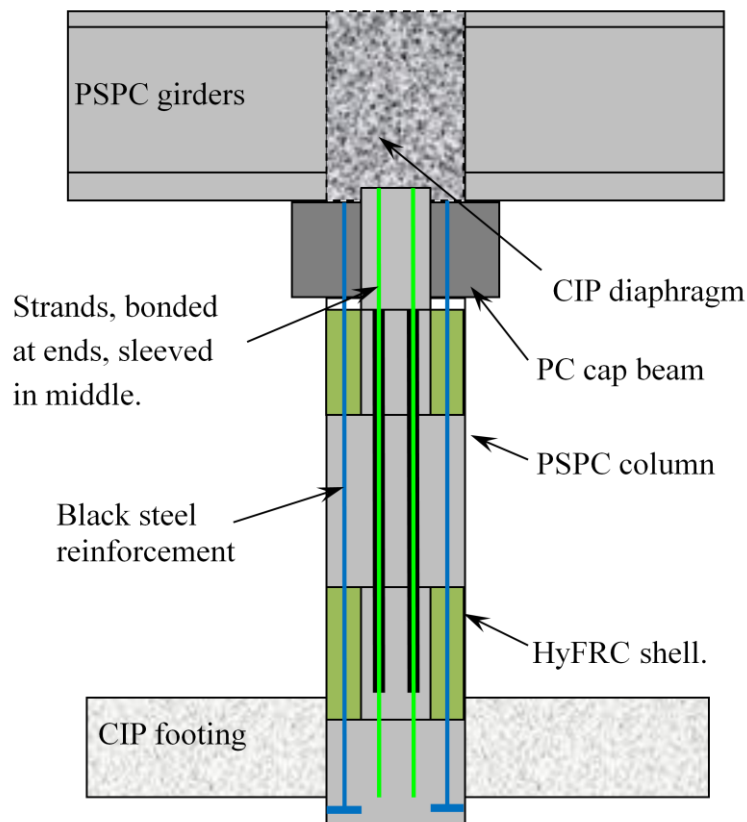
Bridge bent with unbonded pre-tensioned column
